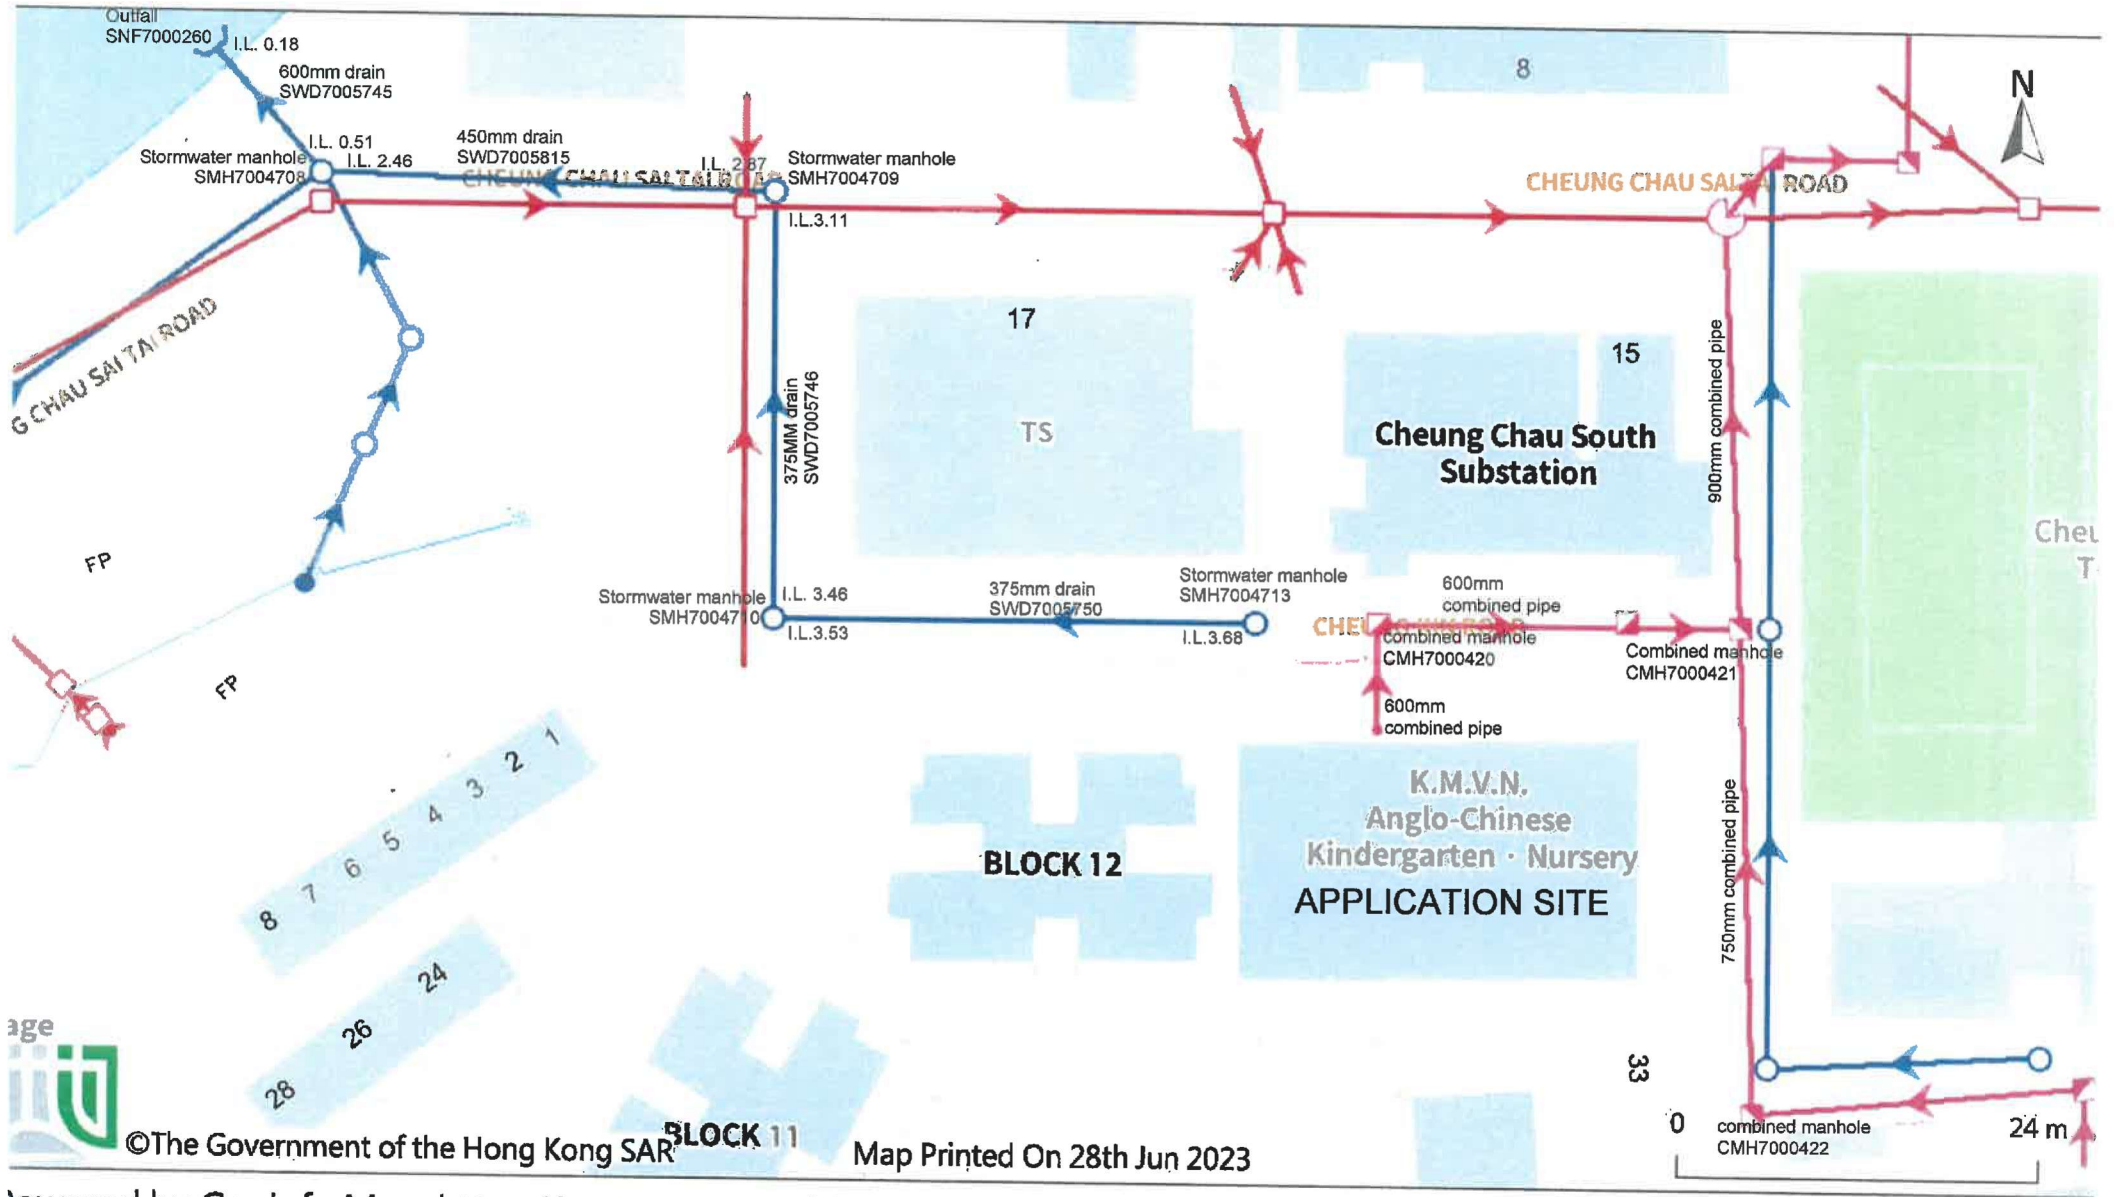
EXISTING SEWERS FROM APPLICATION SITE TO CHEUNG CHAU STW
